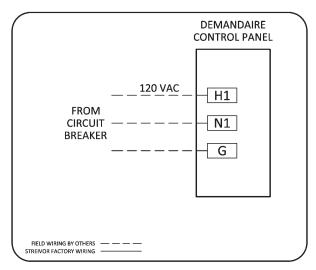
Electric Gas Valve Circuit Input Power Wiring
